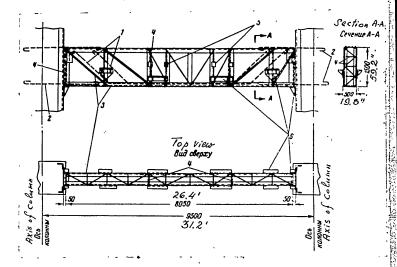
Rigid Welded Steel Reinforcement of a Cross Girder.
